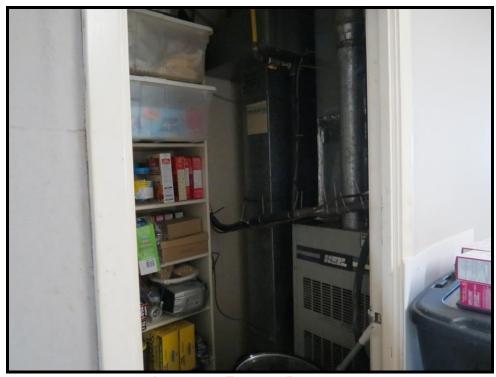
Furnace Room (Photo taken on June 13, 2018; Facing Southeast)
